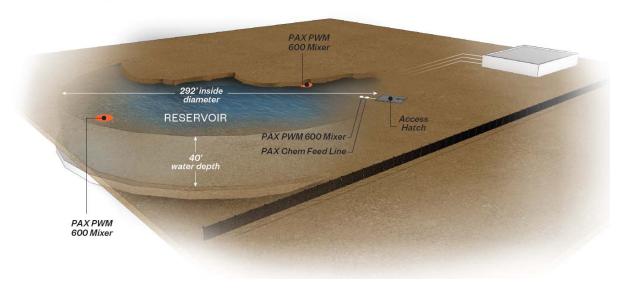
Reservoir 1 Proposed Tank Shark Mixing System Layout
